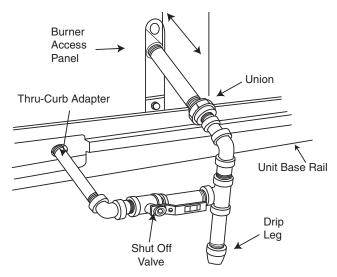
Gas Piping with Thru-Curb Accessory (Alternate Layout)
